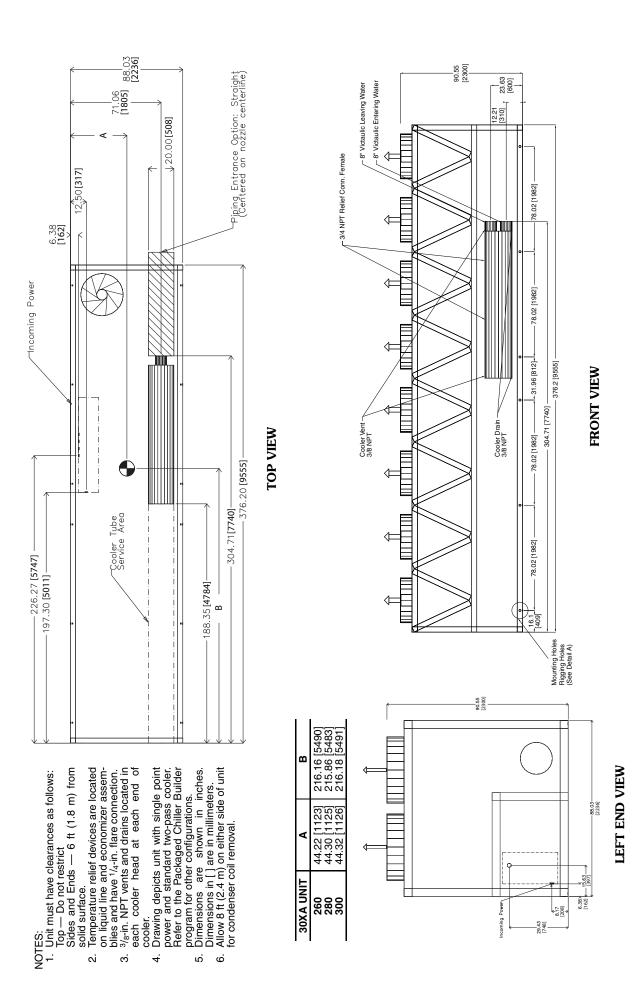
30XA260-300 Air-Cooled Liquid Chiller Dimensions
